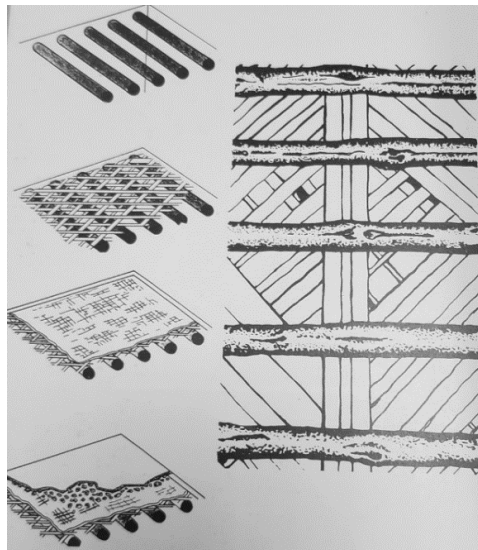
Illustration of vernacular roof construction process (Al-Kholaifi, 2006).
